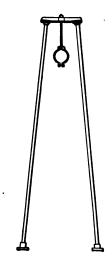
A Frame Pipe Support with Flexible Pipe Hanger.
